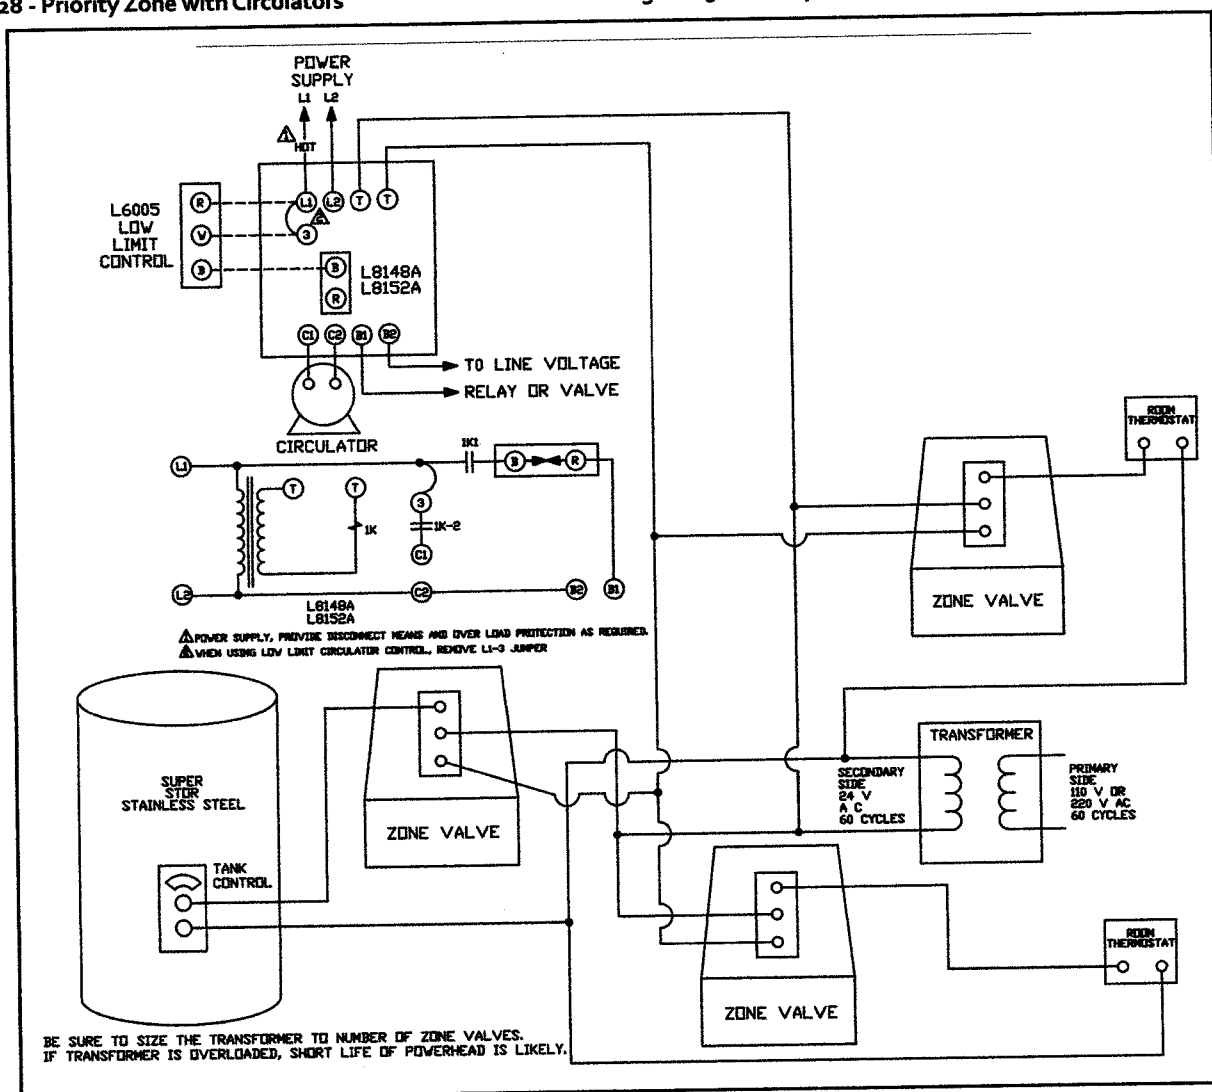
Using L8148A or L8152A Cold Start Boiler Control with Zone Valves
